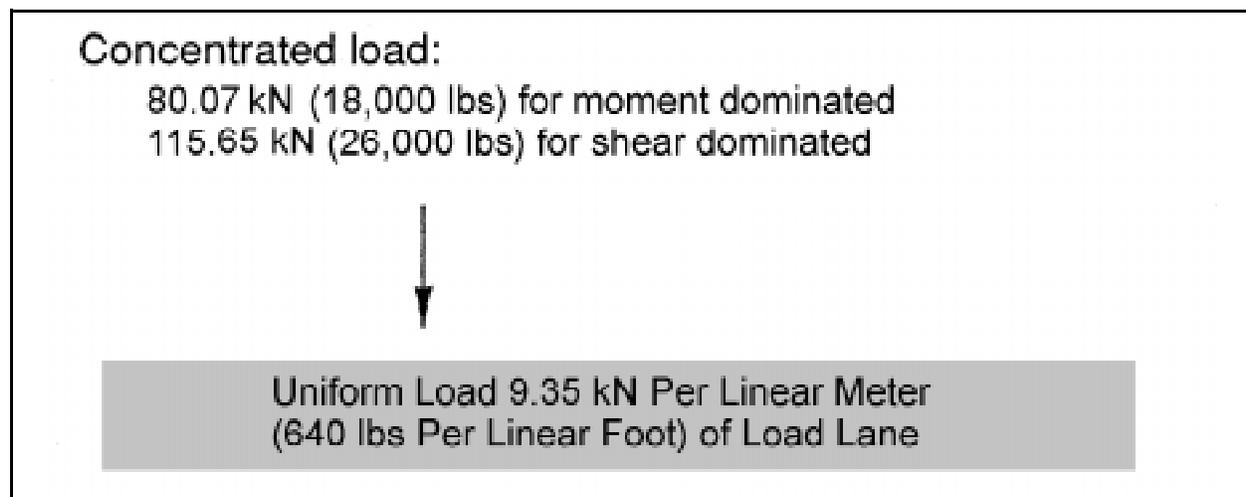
H20-44 lane loading and HS20-44 lane loading
